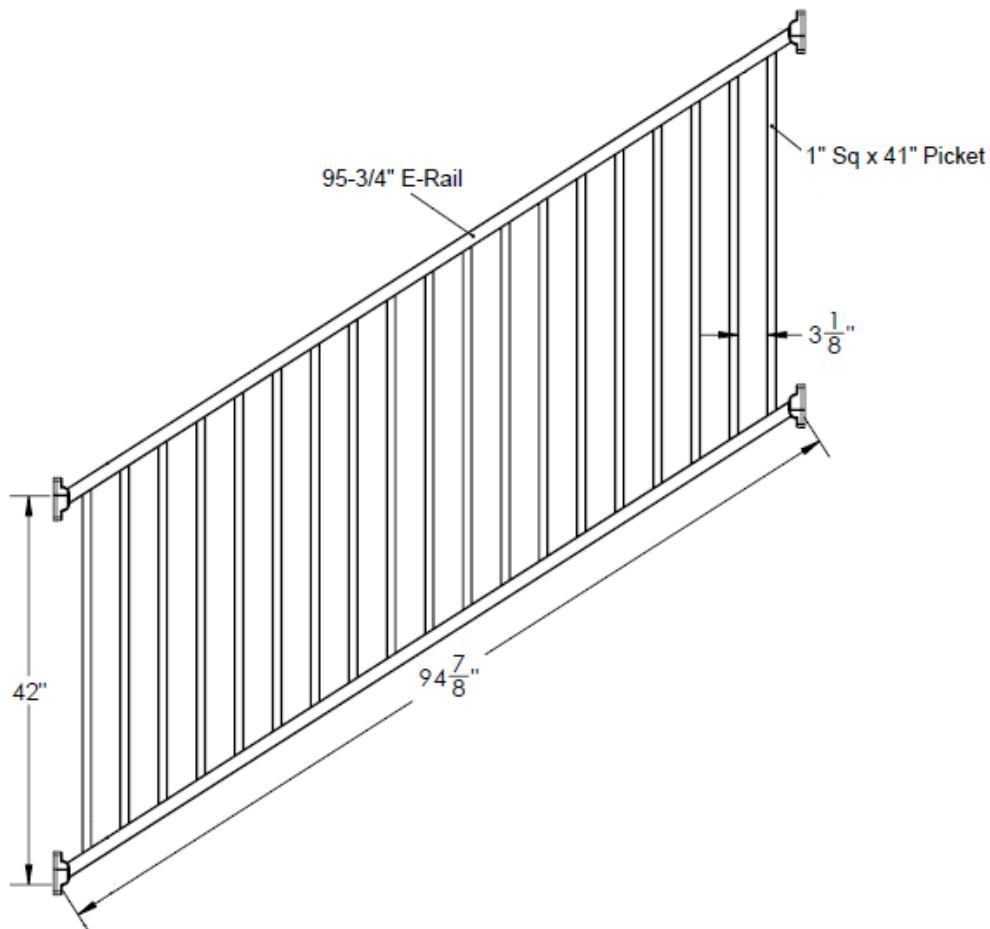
TYPICAL 8' x 42" e-RAIL STAIR RAIL KIT
